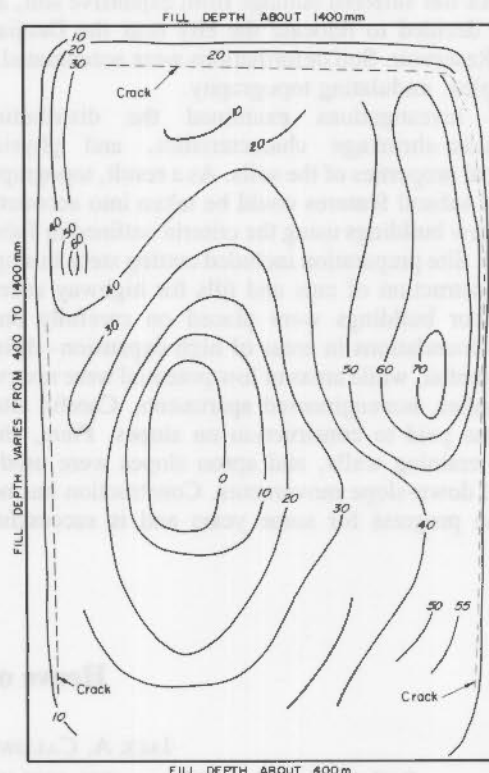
Contours of dining room floor heave. (Heave contours in mm.)
